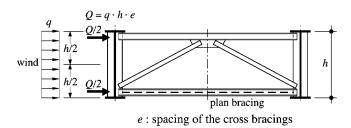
Introduction of forces due to wind into the lower plan bracing via the cross bracing.
